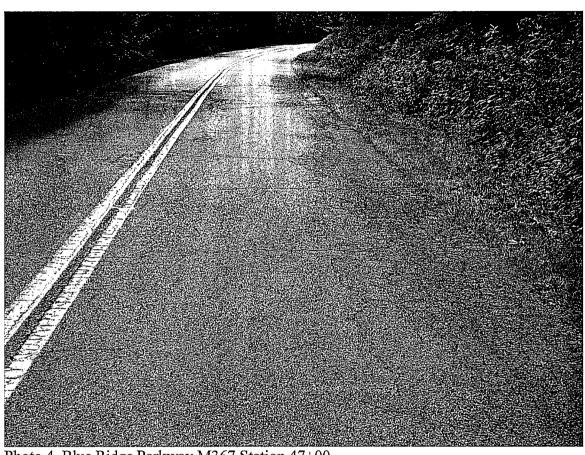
Blue Ridge Parkway M367 Station 47+00 Wheelpath Fatigue Cracking
